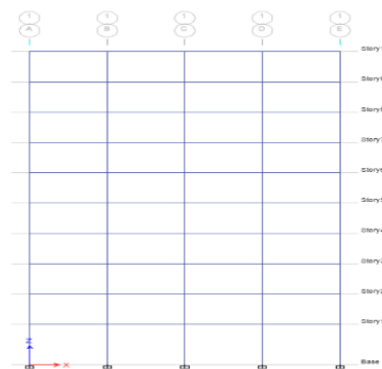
plan view of M1 square plan building Fig 2 elevation view of M1 model
